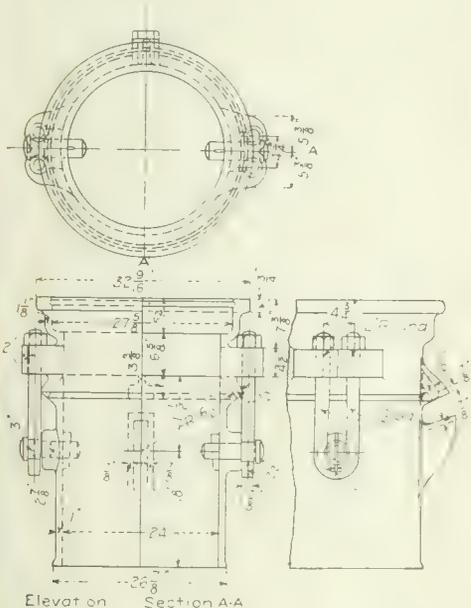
Details of 24-in. Joint, Flexible in Vertical Plane Only, Used in Pipe Line Under Chelsea Creek in 1870.
